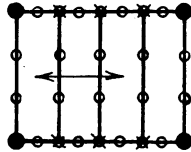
to Fig. 54. Showing Distribution of Supports in Typical Floor Construction.
